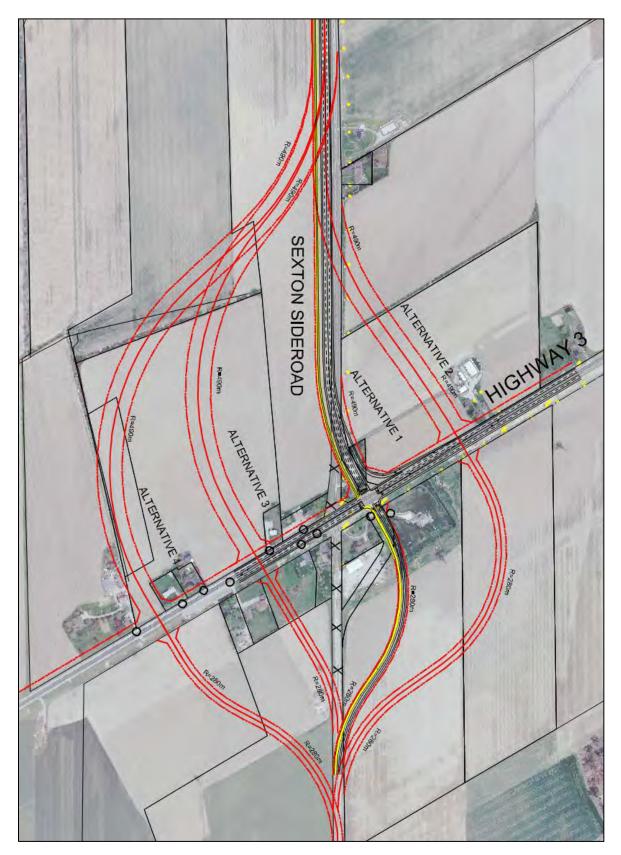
LAUZON PARKWAY AND HIGHWAY 3 INTERSECTION ALTERNATIVES
